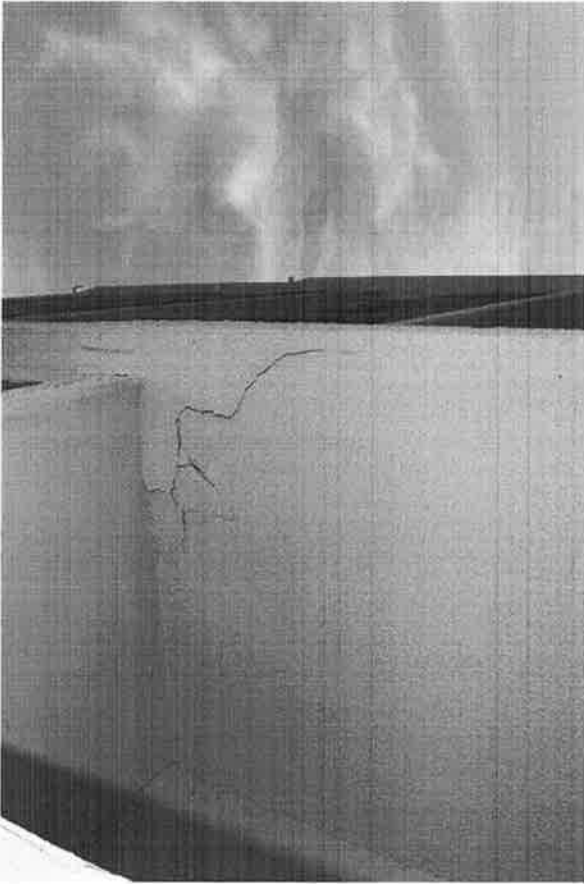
Isolated crack in previously repaired CMU wall at unit 1101 (typical)
